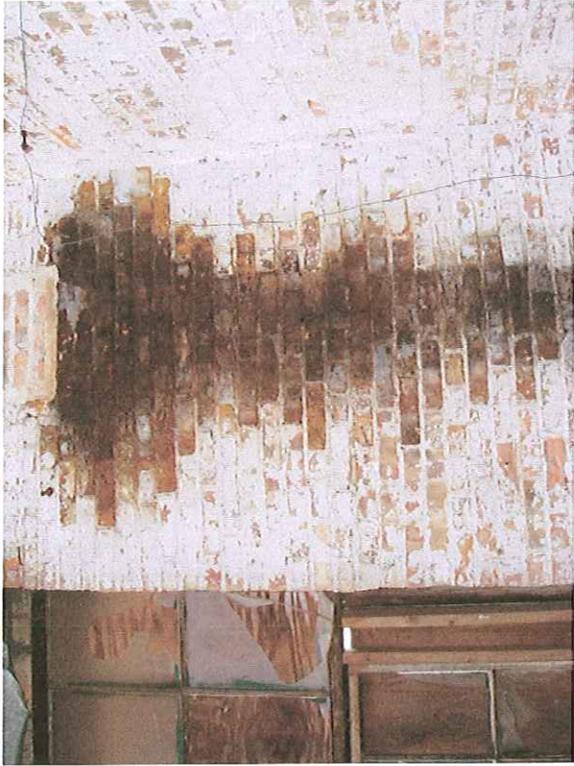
Oil staining on north wall of Room 4 near the northeast corner of the room.
